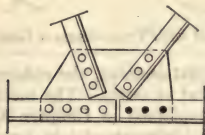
Detail of Joint E, Fink Truss, Fig. 7
